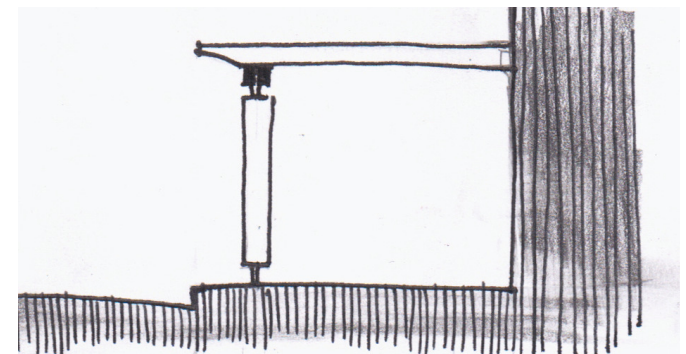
Sectional diagram showing shade structure when attached to non-heritage building
